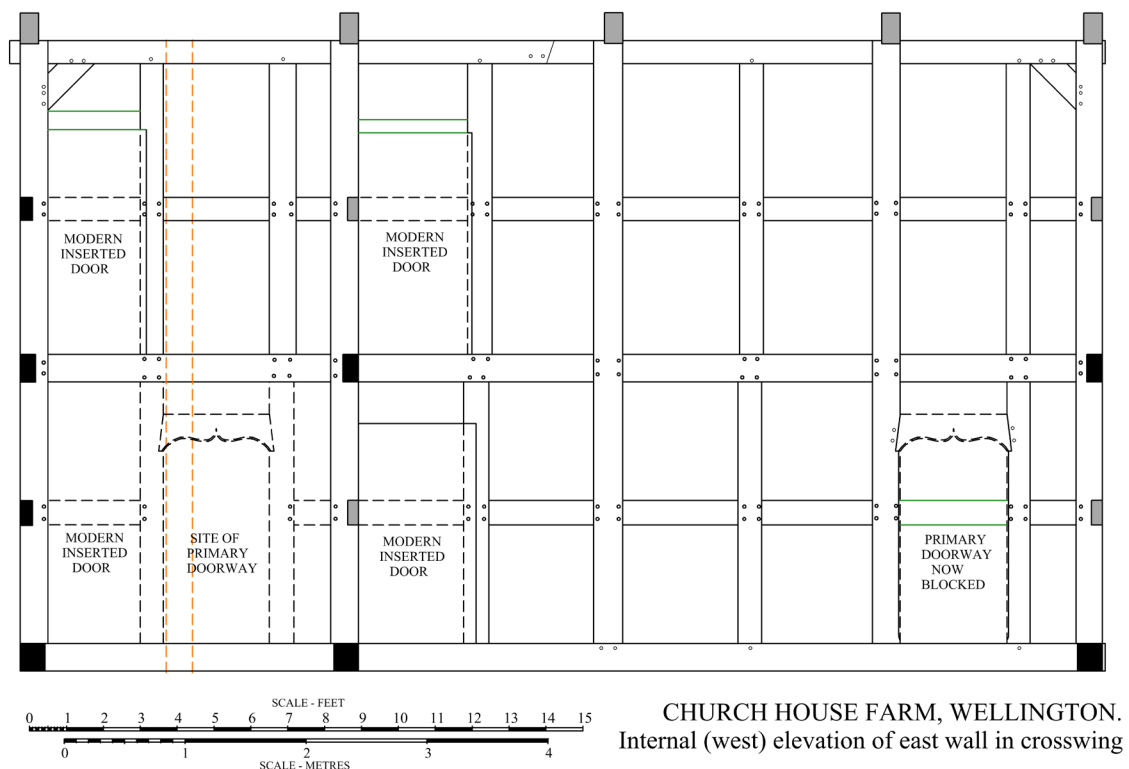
The surviving timber-framed east wall of the crosswing (west elevation).
